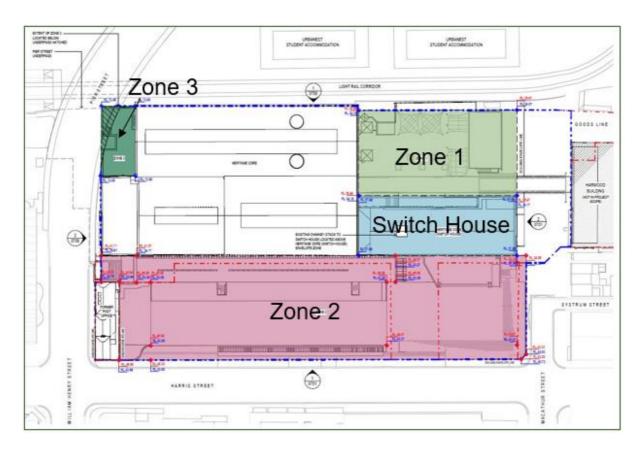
| Building Envelope Plan (Source: Architectural Plans)
